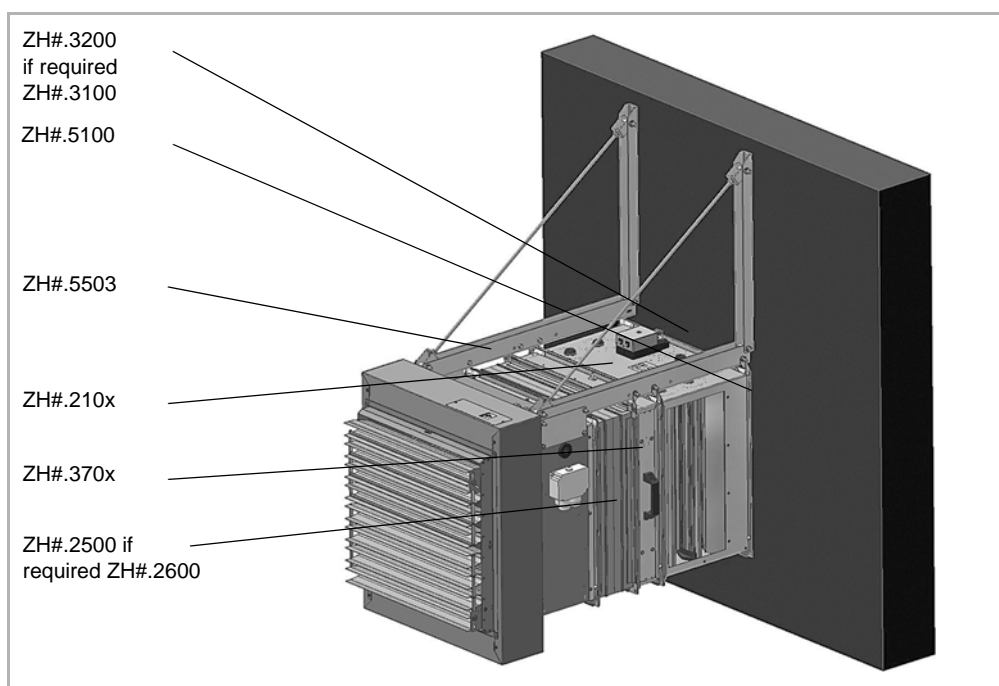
Wall mounting of a mixed air unit with accessory items and „modular“ suspension (ZH#.5503)
